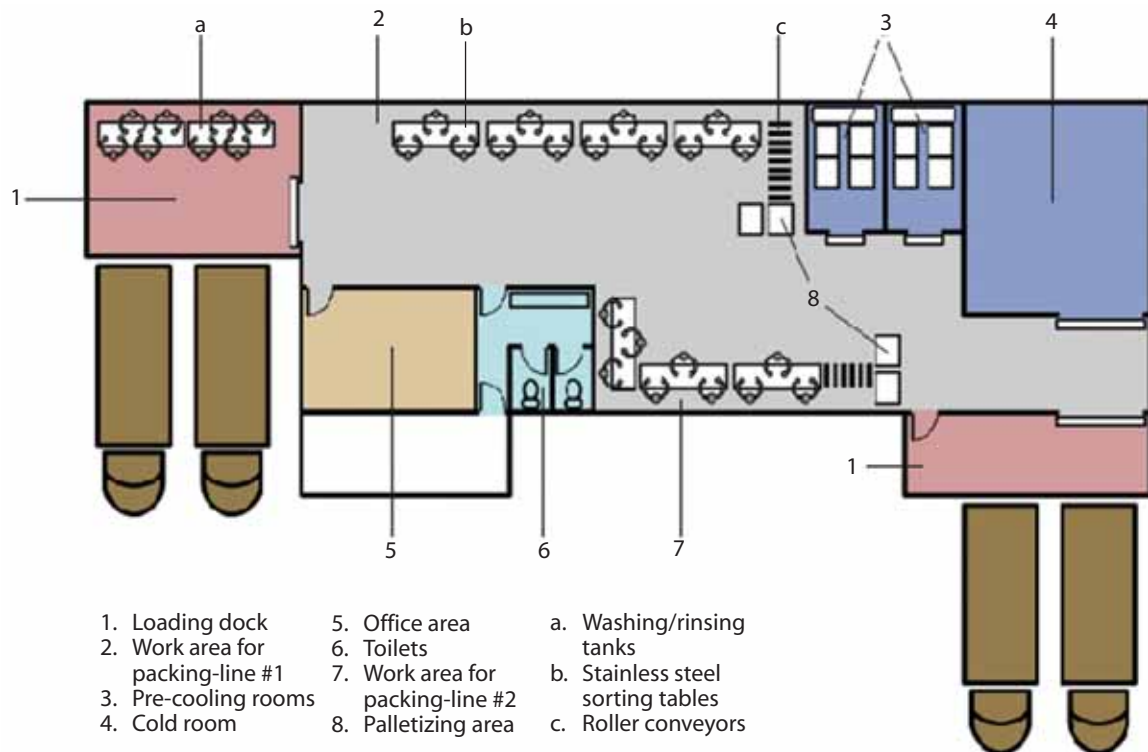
Floor plan layout of a packing-house equipped with two packing-lines (adapted from Kitinoja 2007)
